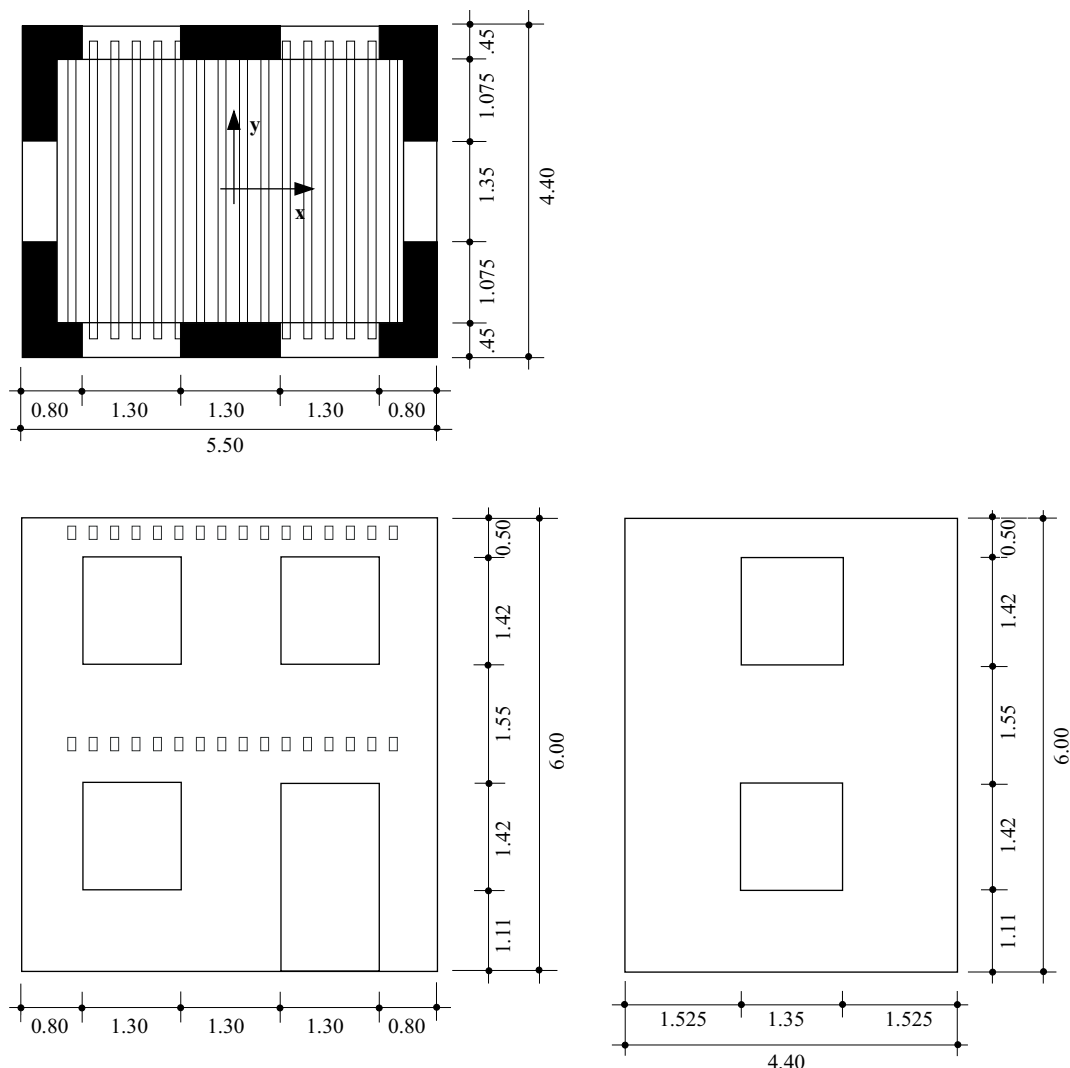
Plan and elevation of the model buildings tested dynamically at the testing centre ISMES [BP 96], dimensions in m
